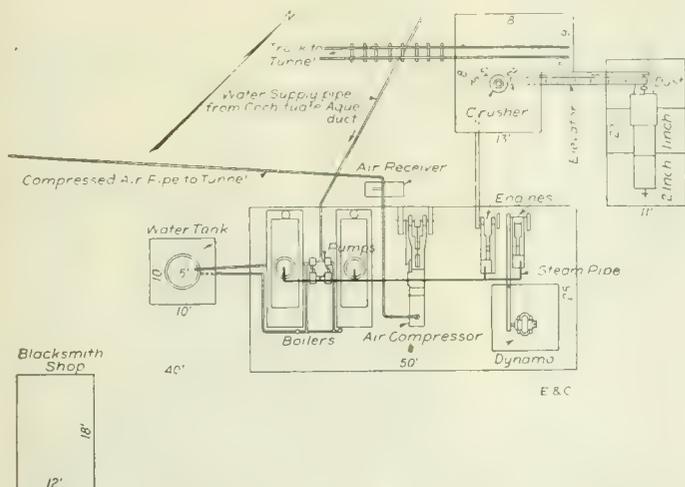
Sketch of Contractor's Plant Layout at East Portal of Water Tunnel Through Waban Hill, Newton, Mass.
